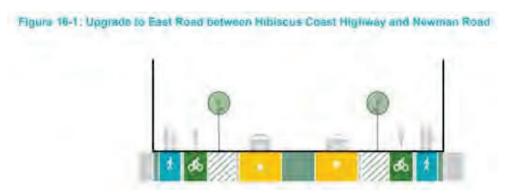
Proposed Cross Section of Roading Upgrades (24m) in the vicinity of the Submitter's site.
